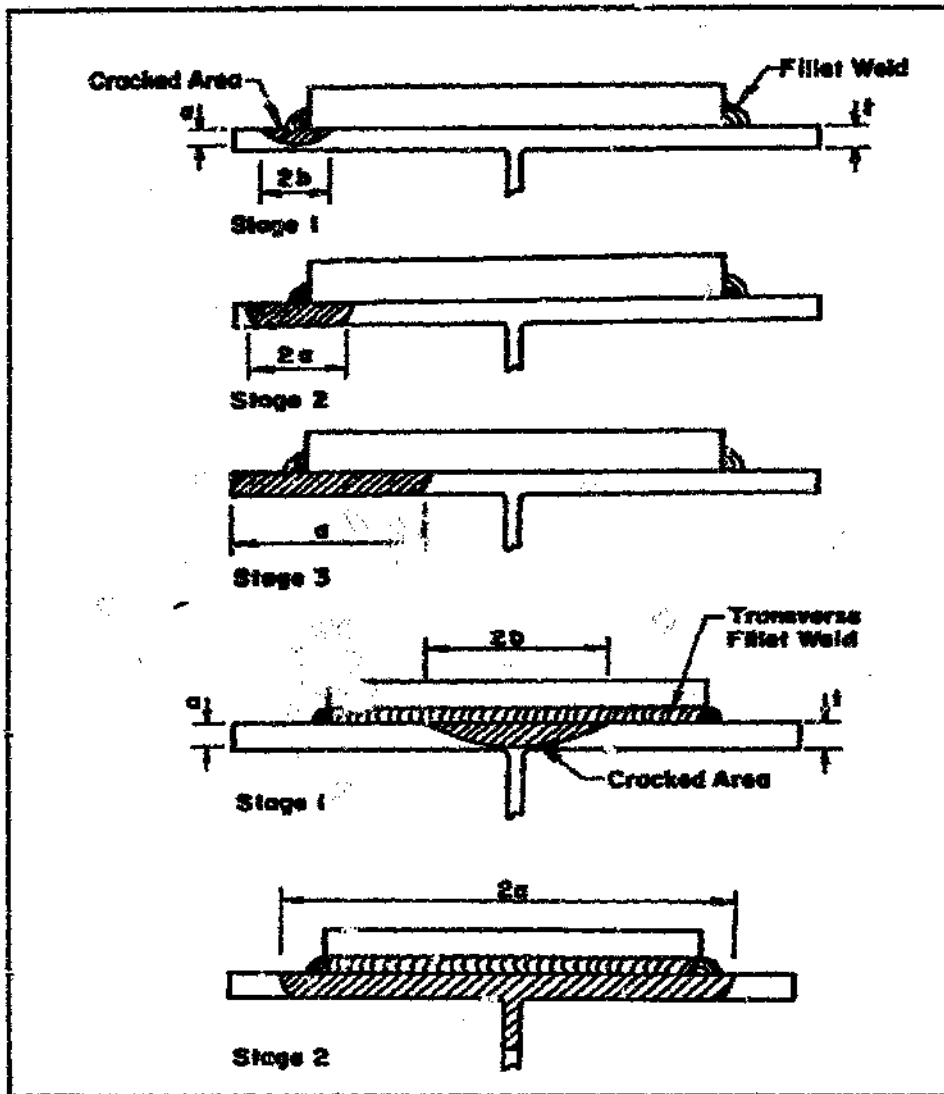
The typical stages in the growth of cracks at longitudinal and transverse fillet welds in I-beams welded with cover plates⁽¹⁾.
